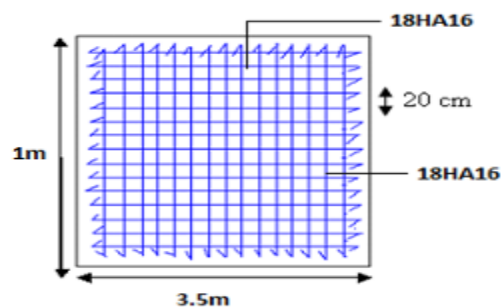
Diagram of reinforcement for the footing under the wall.
